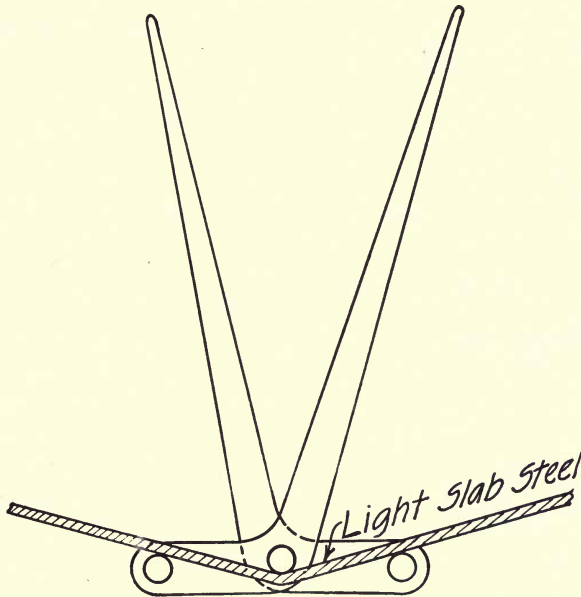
Tongs for Bending Light Steel Bars. (See p. 96.)
